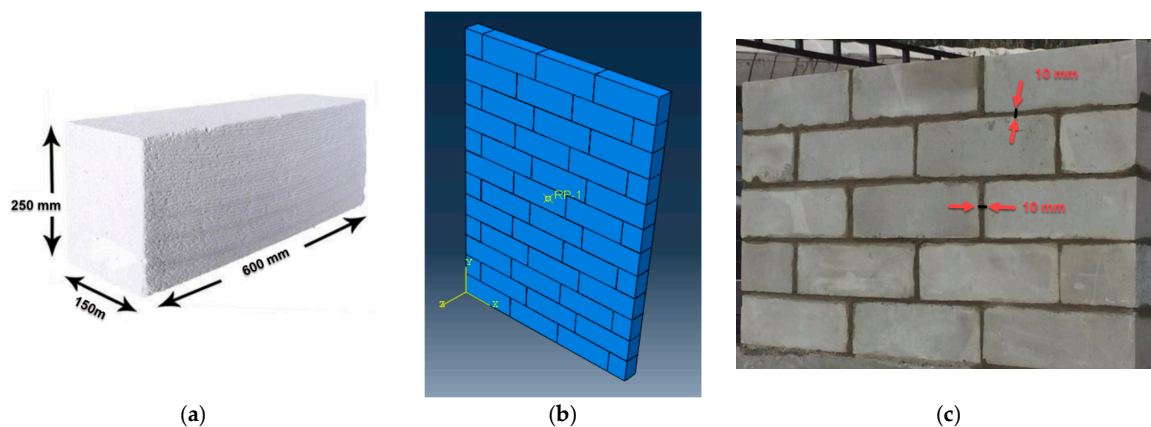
Specifications of the AAC wall and block model: (a) AAC block dimensions; (b) FE model of the wall; (c) assumed thickness of grout layer.
